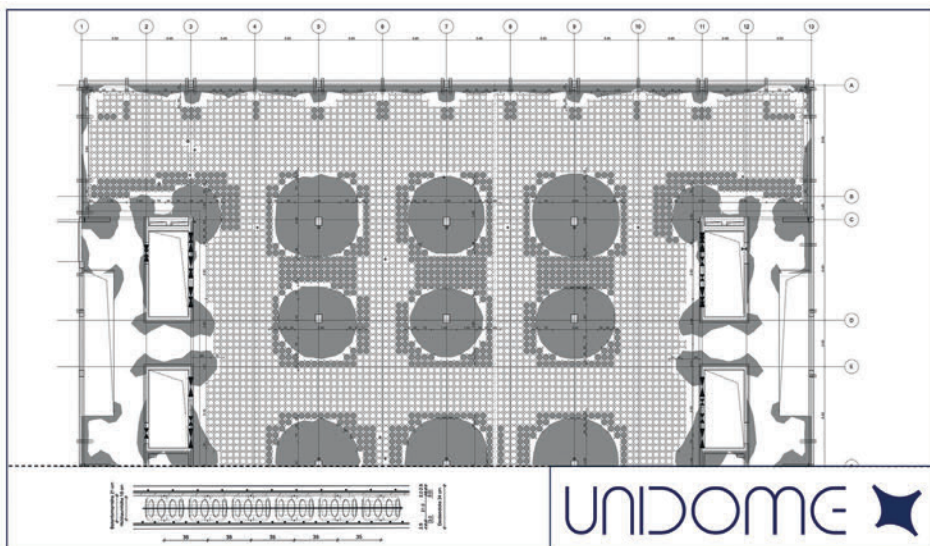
Installation plan - arrangement of void formers in a common structural slab
